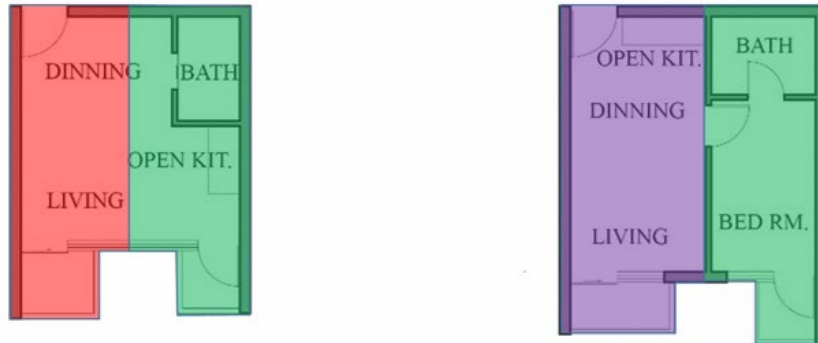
Modularisation of a typical studio (left) and one-bedroom (right) unit plan
